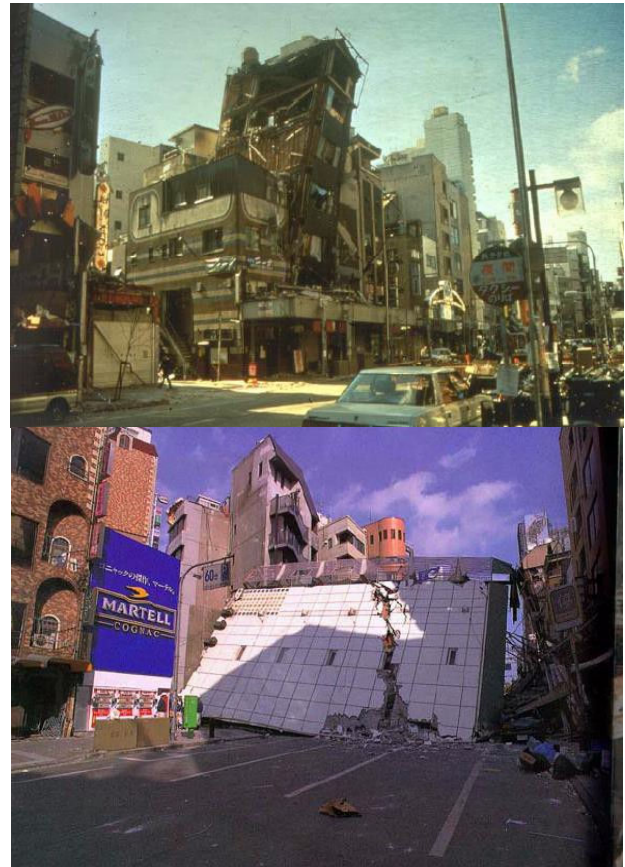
Example of damage witnessed after the 1995 Kobe, Japan earthquake (a) An unstable building structure [1]. (b) An unstable building structure which collapsed less than 24 hours after the original earthquake [1]
